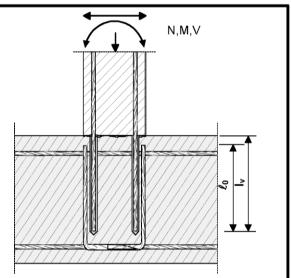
Anchoring of reinforcement to cover the line of acting tensile force
